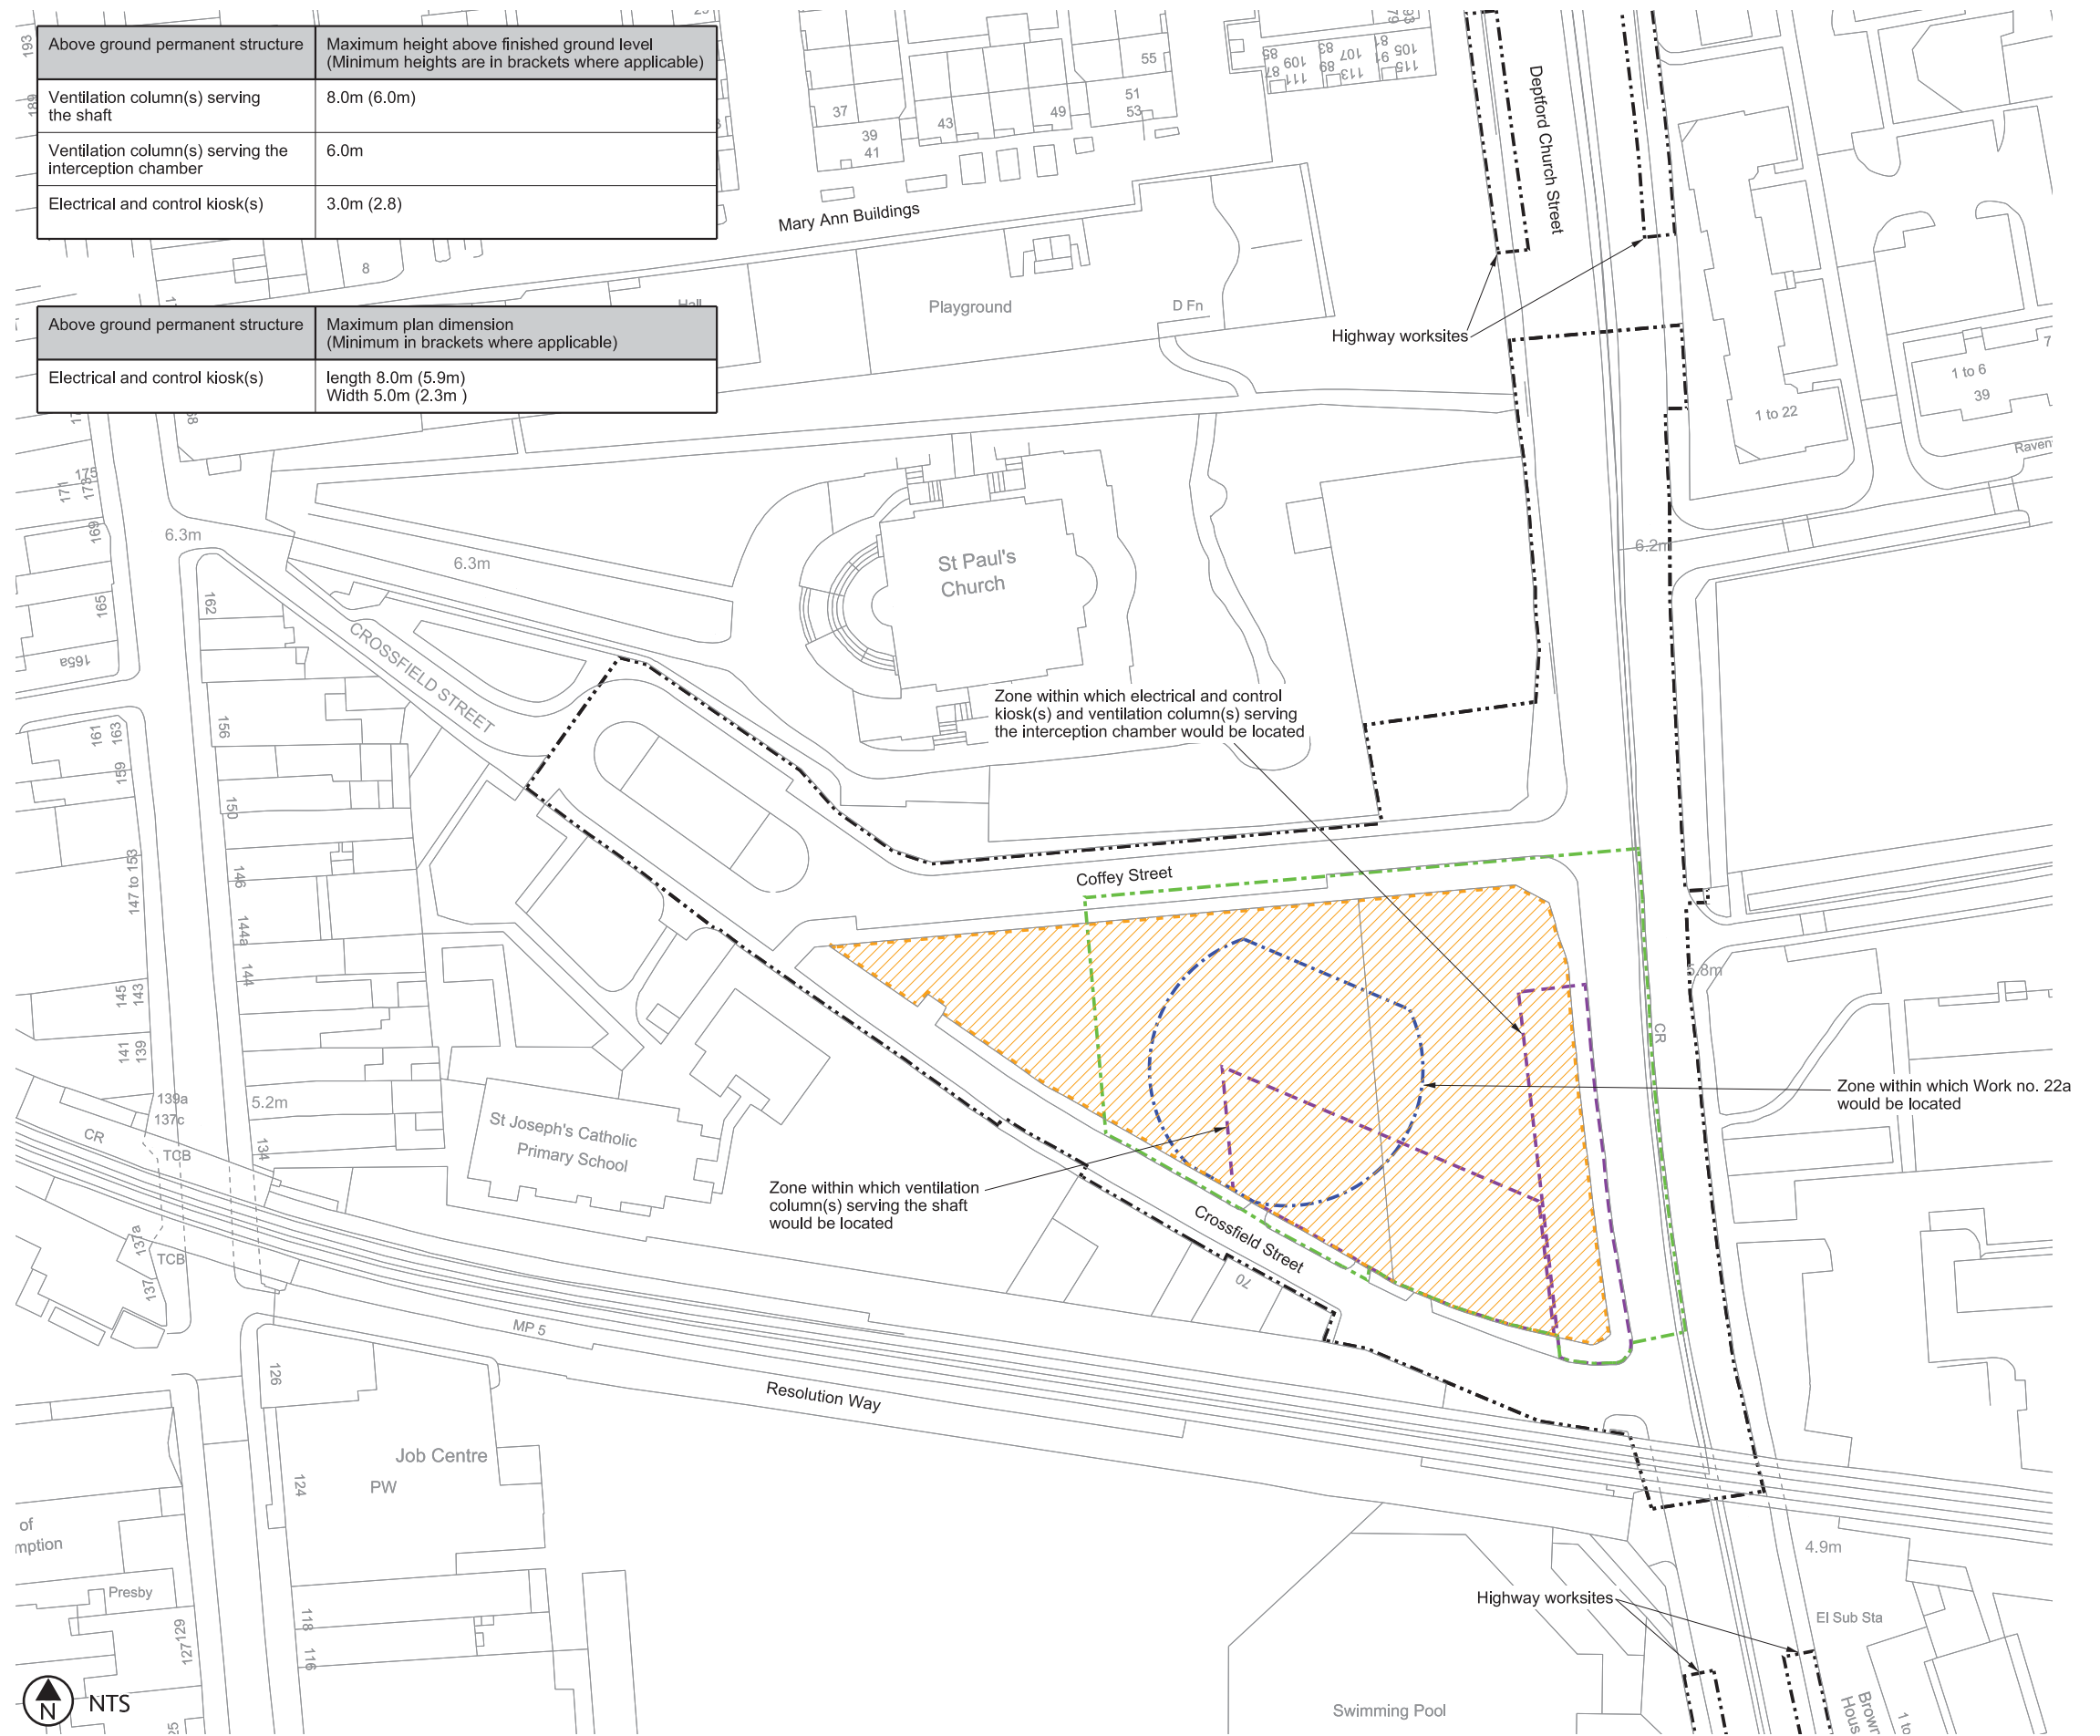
Parameter plan-refer to Parameter plan in the *Book of Plans
